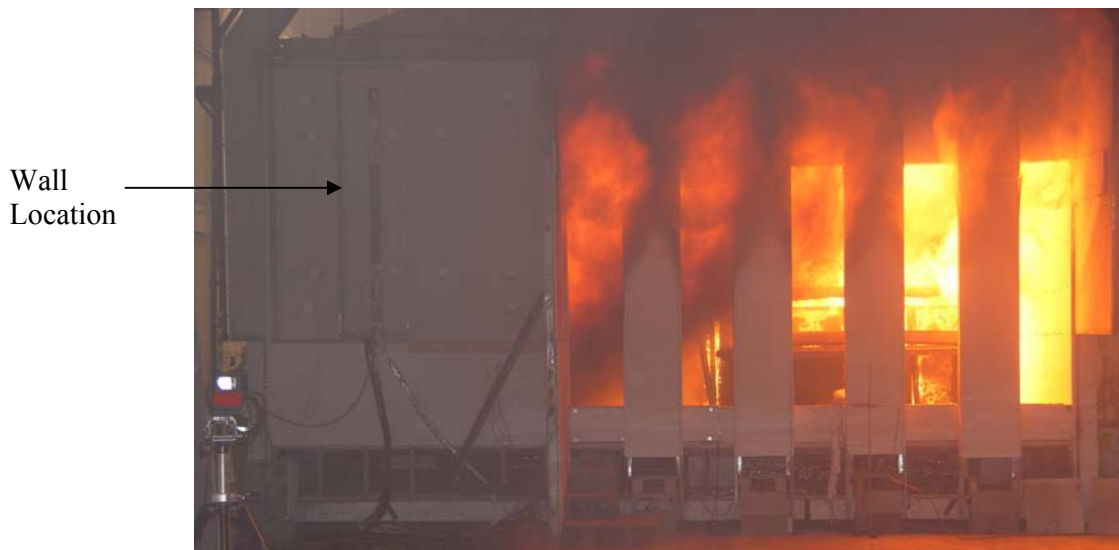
Photograph of the compartment where Assembly One and Assembly Two were installed.
